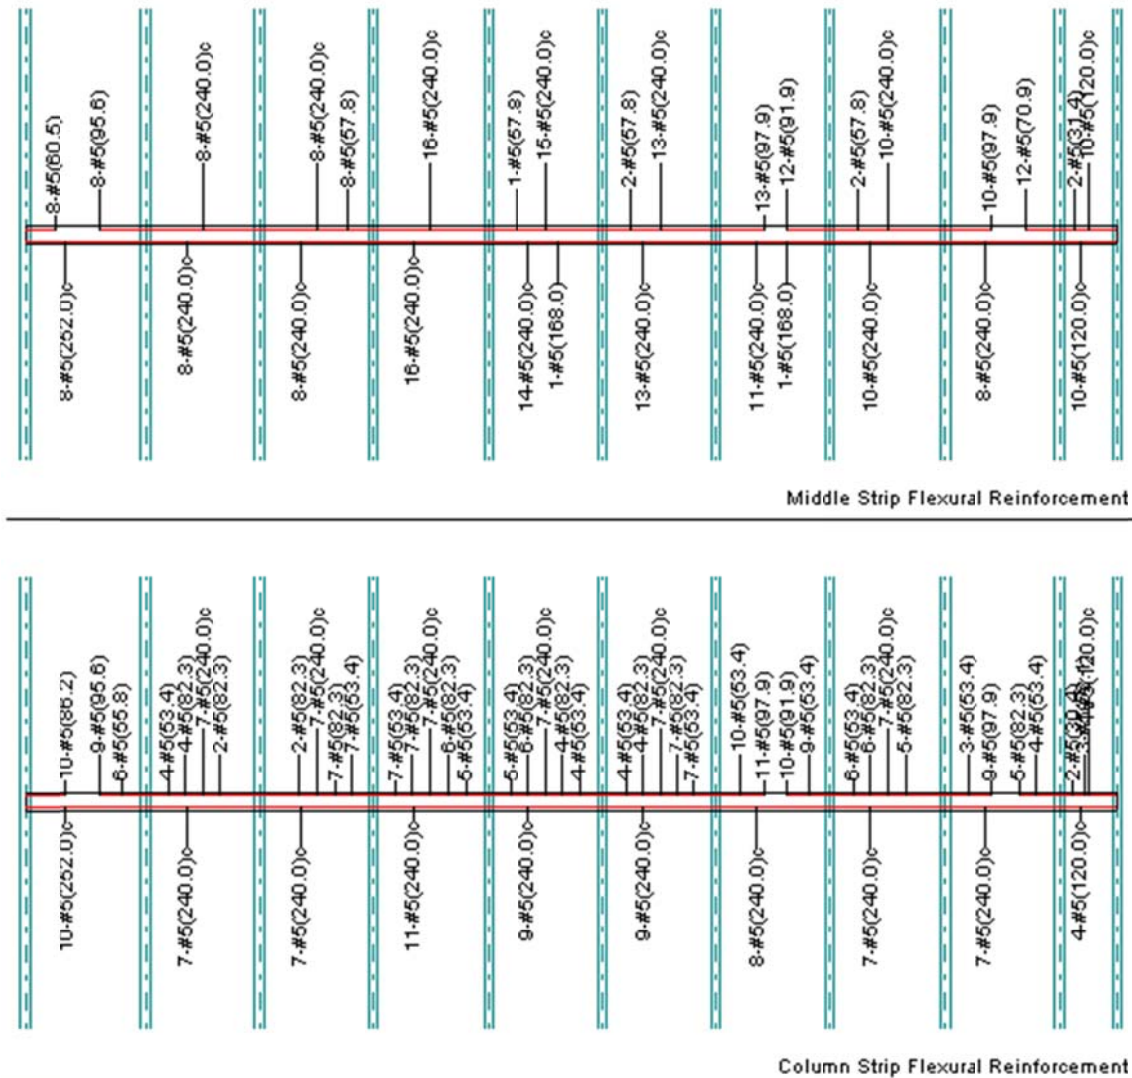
spSlab Column Line 3 Reinforcing Diagram
